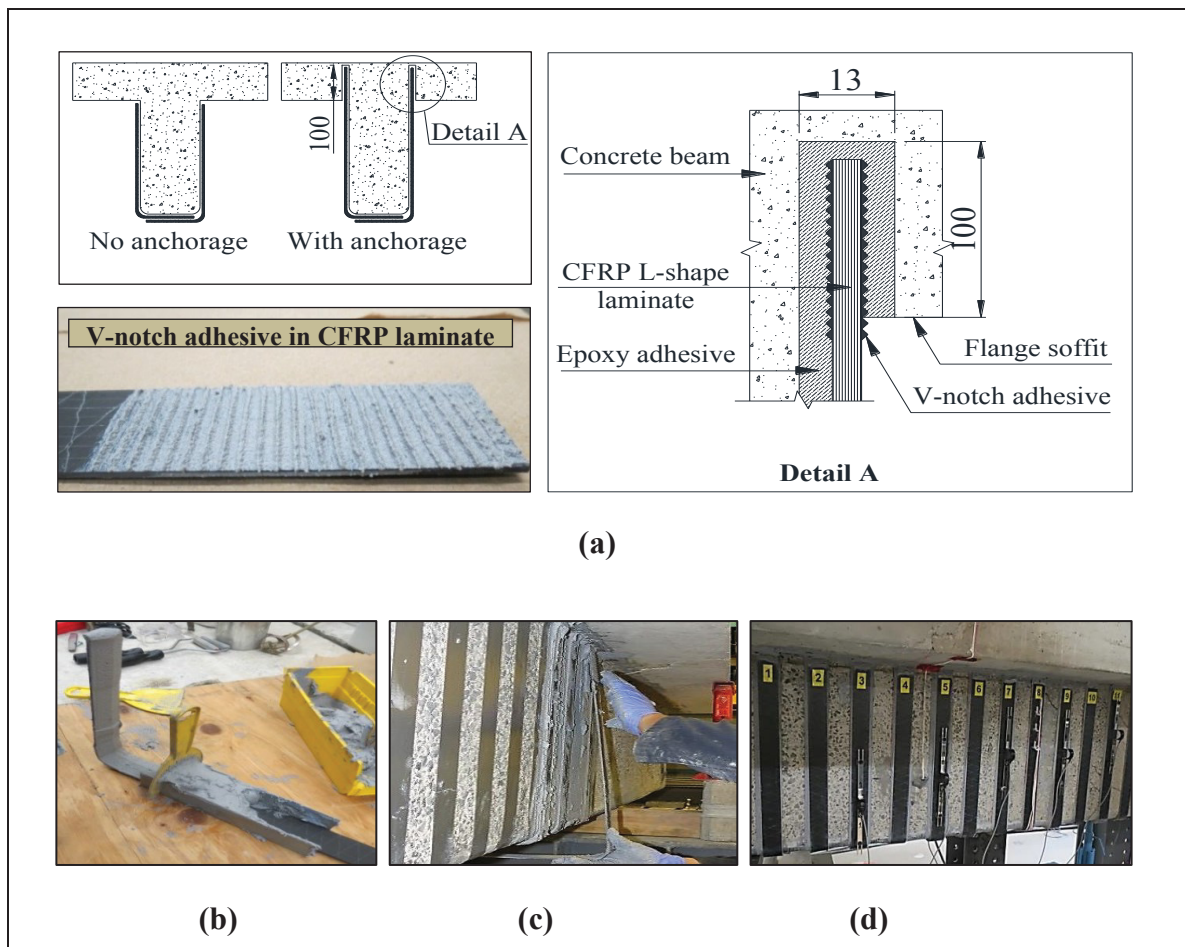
Strengthening with L-shape laminate (dimensions are in mm): (a) Detail of anchorage of vertical end leg in flange; (b) Epoxy in an apex shape on the laminates (c) Installation anchorage CFRP laminate; (d) Strengthened beam and external instrumentation
